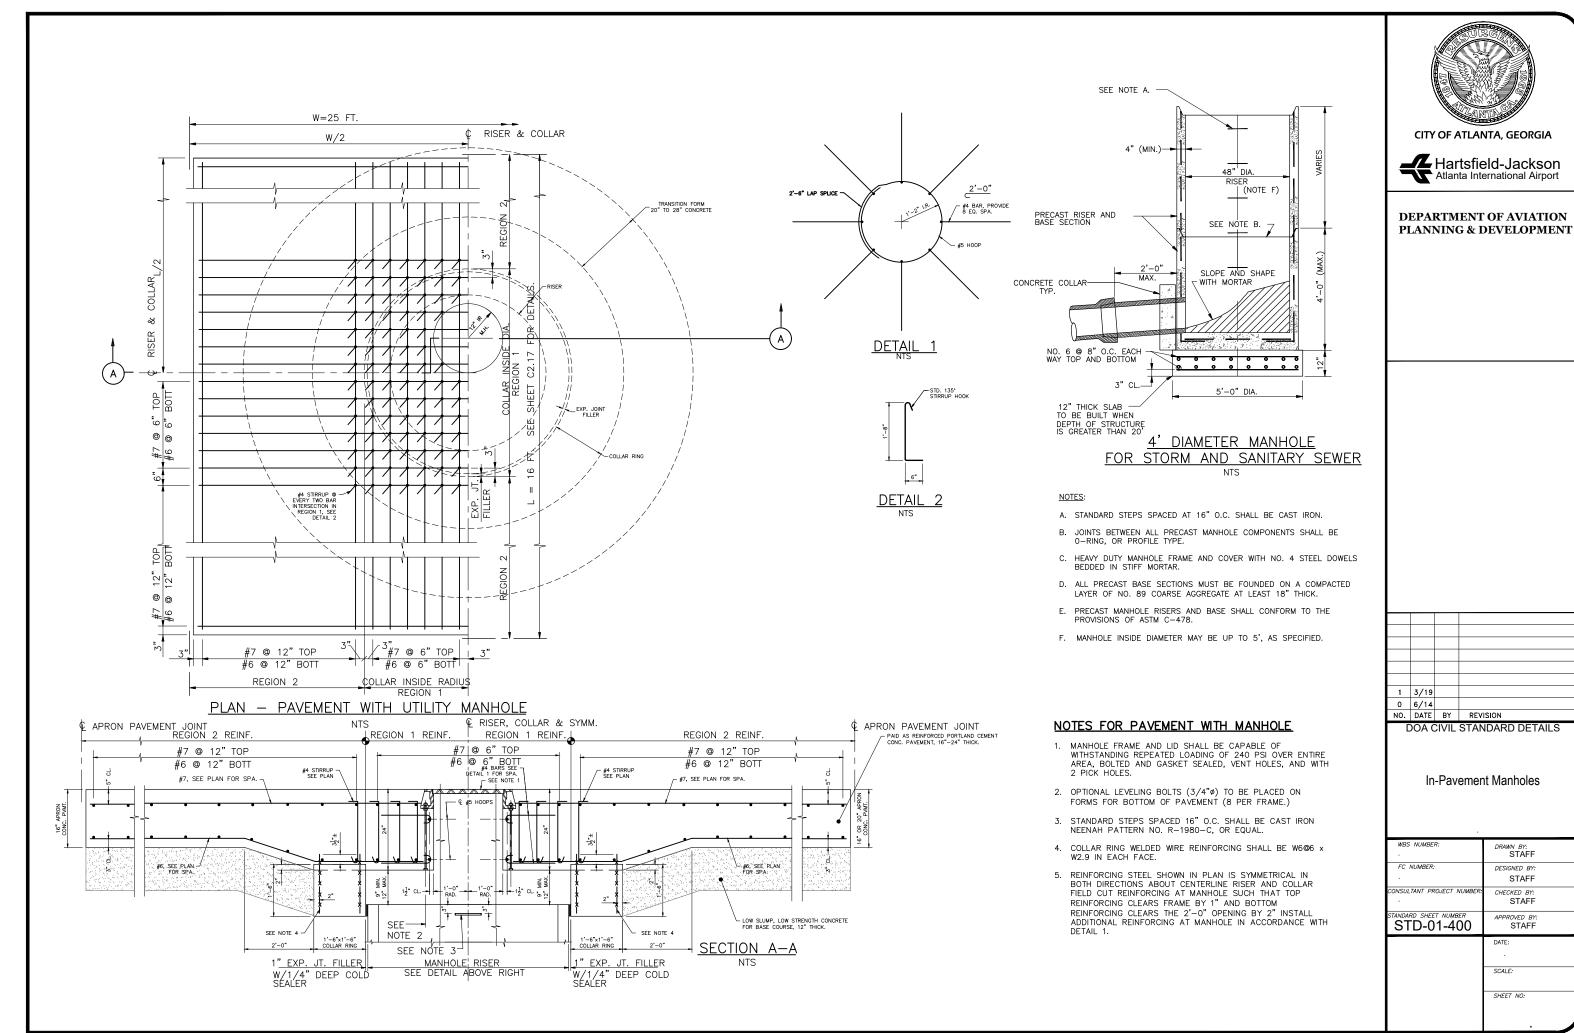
DETAILS ON THIS SHEET ARE INTENDED FOR USE IN PAVEMENT REPLACEMENT AND RETROFIT PROJECTS.
